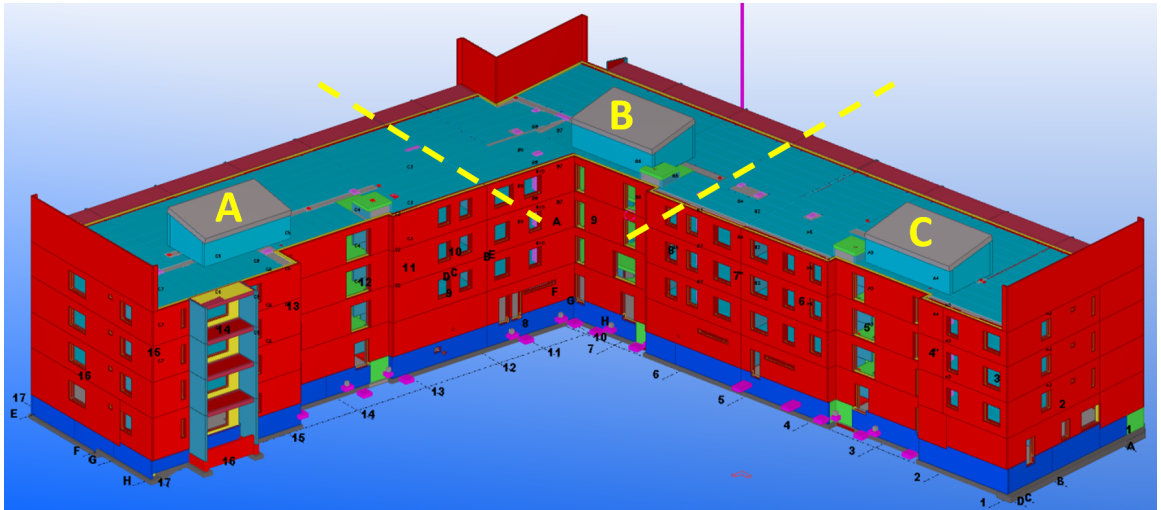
Overview of the multi-story precast apartment building model and its sections.
